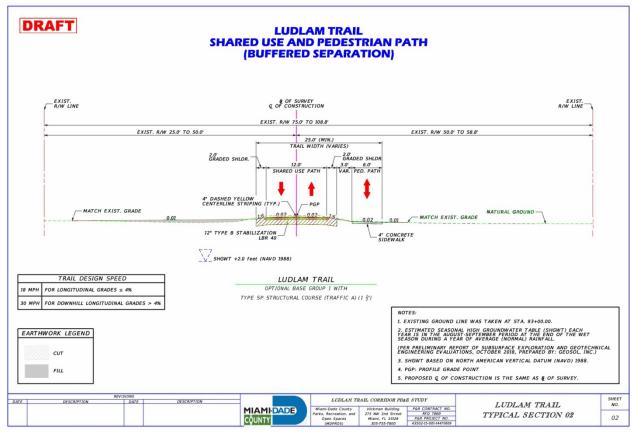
Proposed Typical Cross Section for the Ludlam Trail Multi-Use and Pedestrian Path (Buffered Separation)
